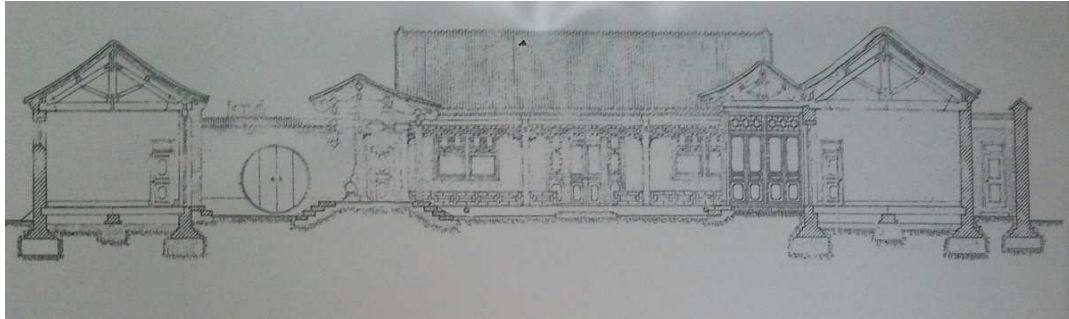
First-place design rental-house by Xu Ruifang, facade, section and plans
